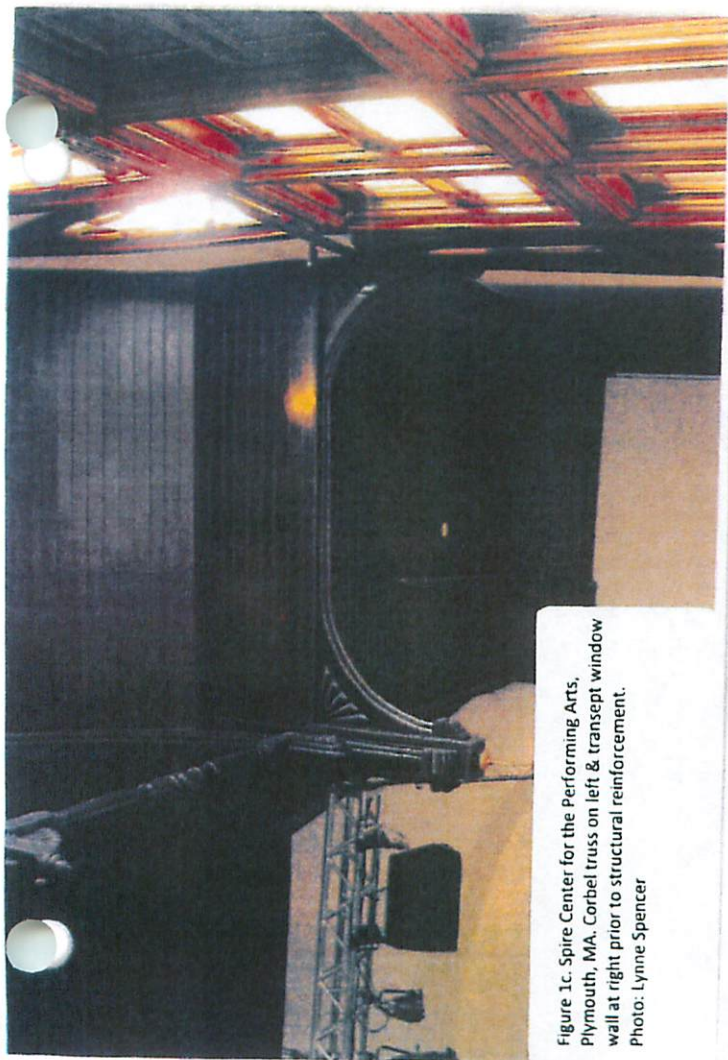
Spire Center for the Performing Arts, Plymouth, MA. Corbel truss on left & transept window wall at right prior to structural reinforcement.
